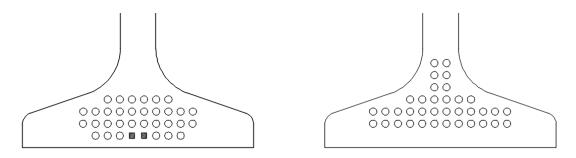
NU-1600 Girder Harp Design with Span Length of 125 ft
